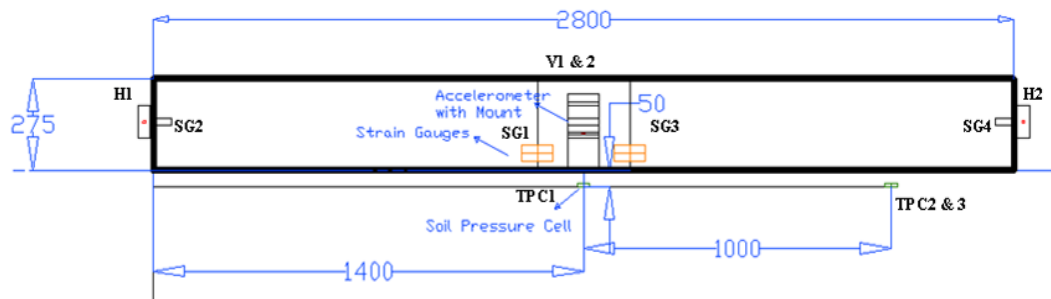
Instrumentation layout for Slab 1 (Front View)
